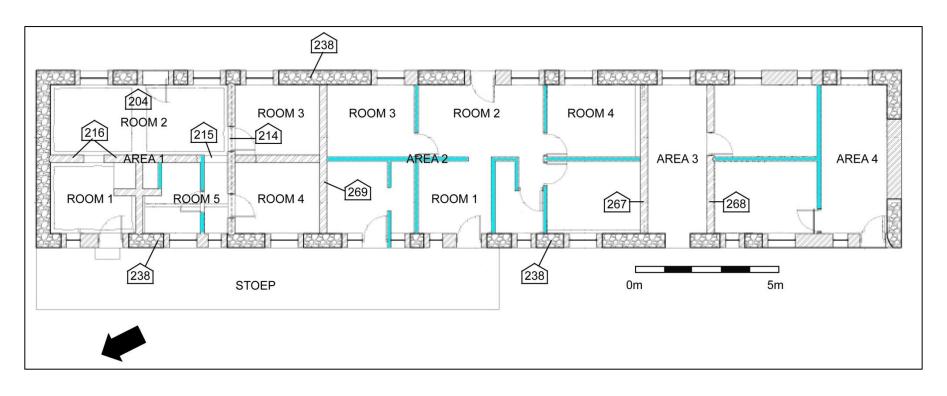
Plan of layout of Delta stable building prior to excavation. New walls indicated in blue. (Adapted from plans provided by Thorold Architects)
